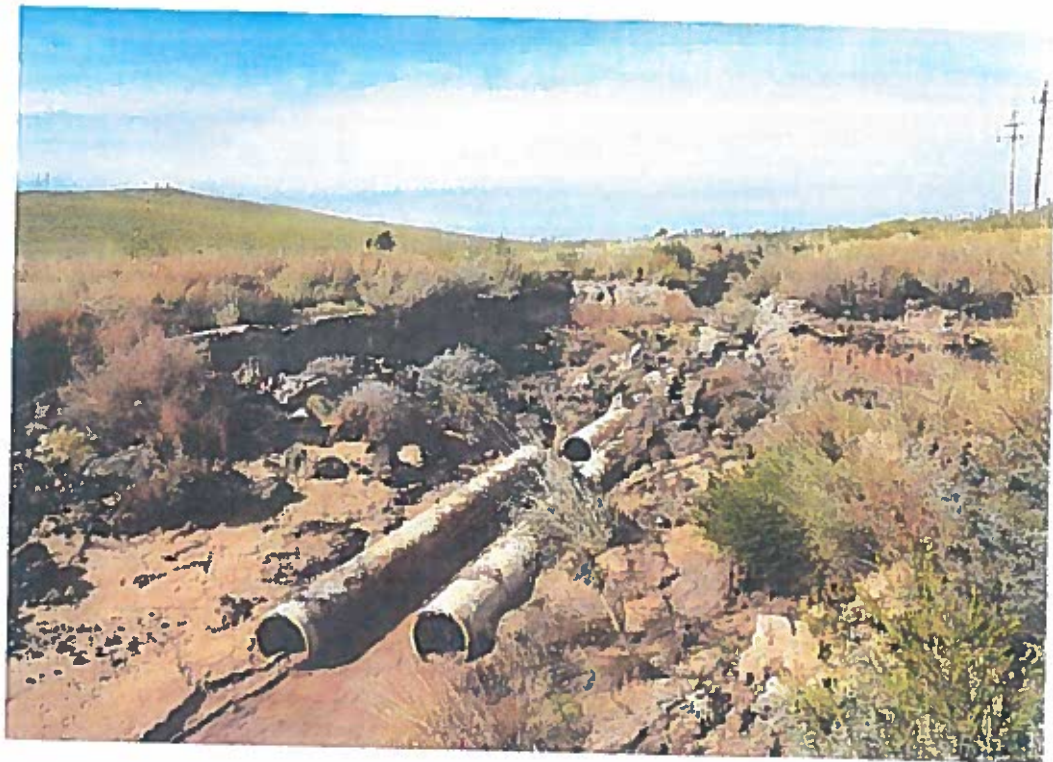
View of erosion and drainage of wetland and pipes within the trench.
